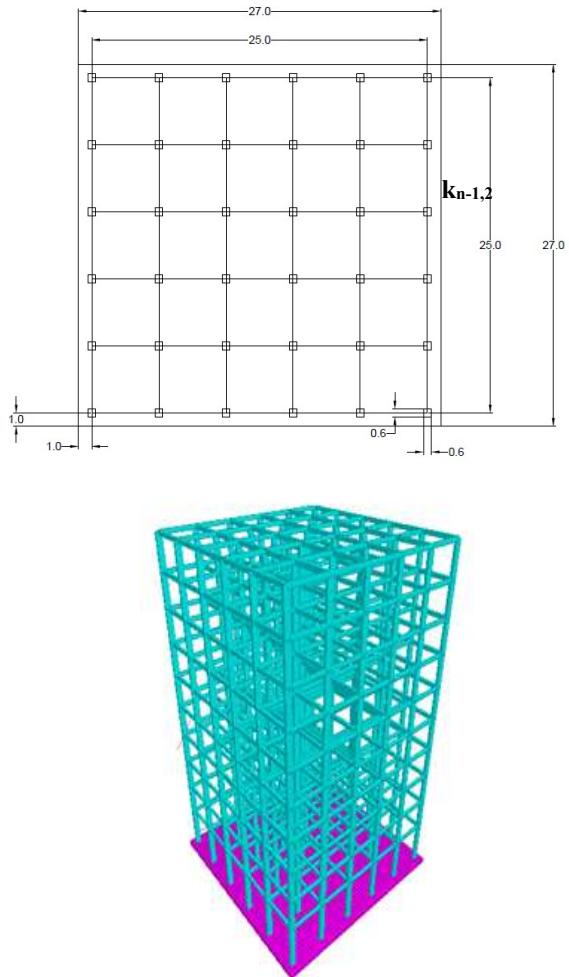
Plan view (dimensions in m) and Isometric view of the modelled building
